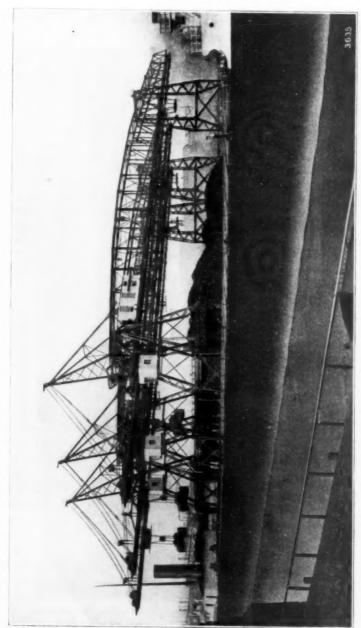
Bridge Tramway Type of Bituminous Coal Storage Plant
